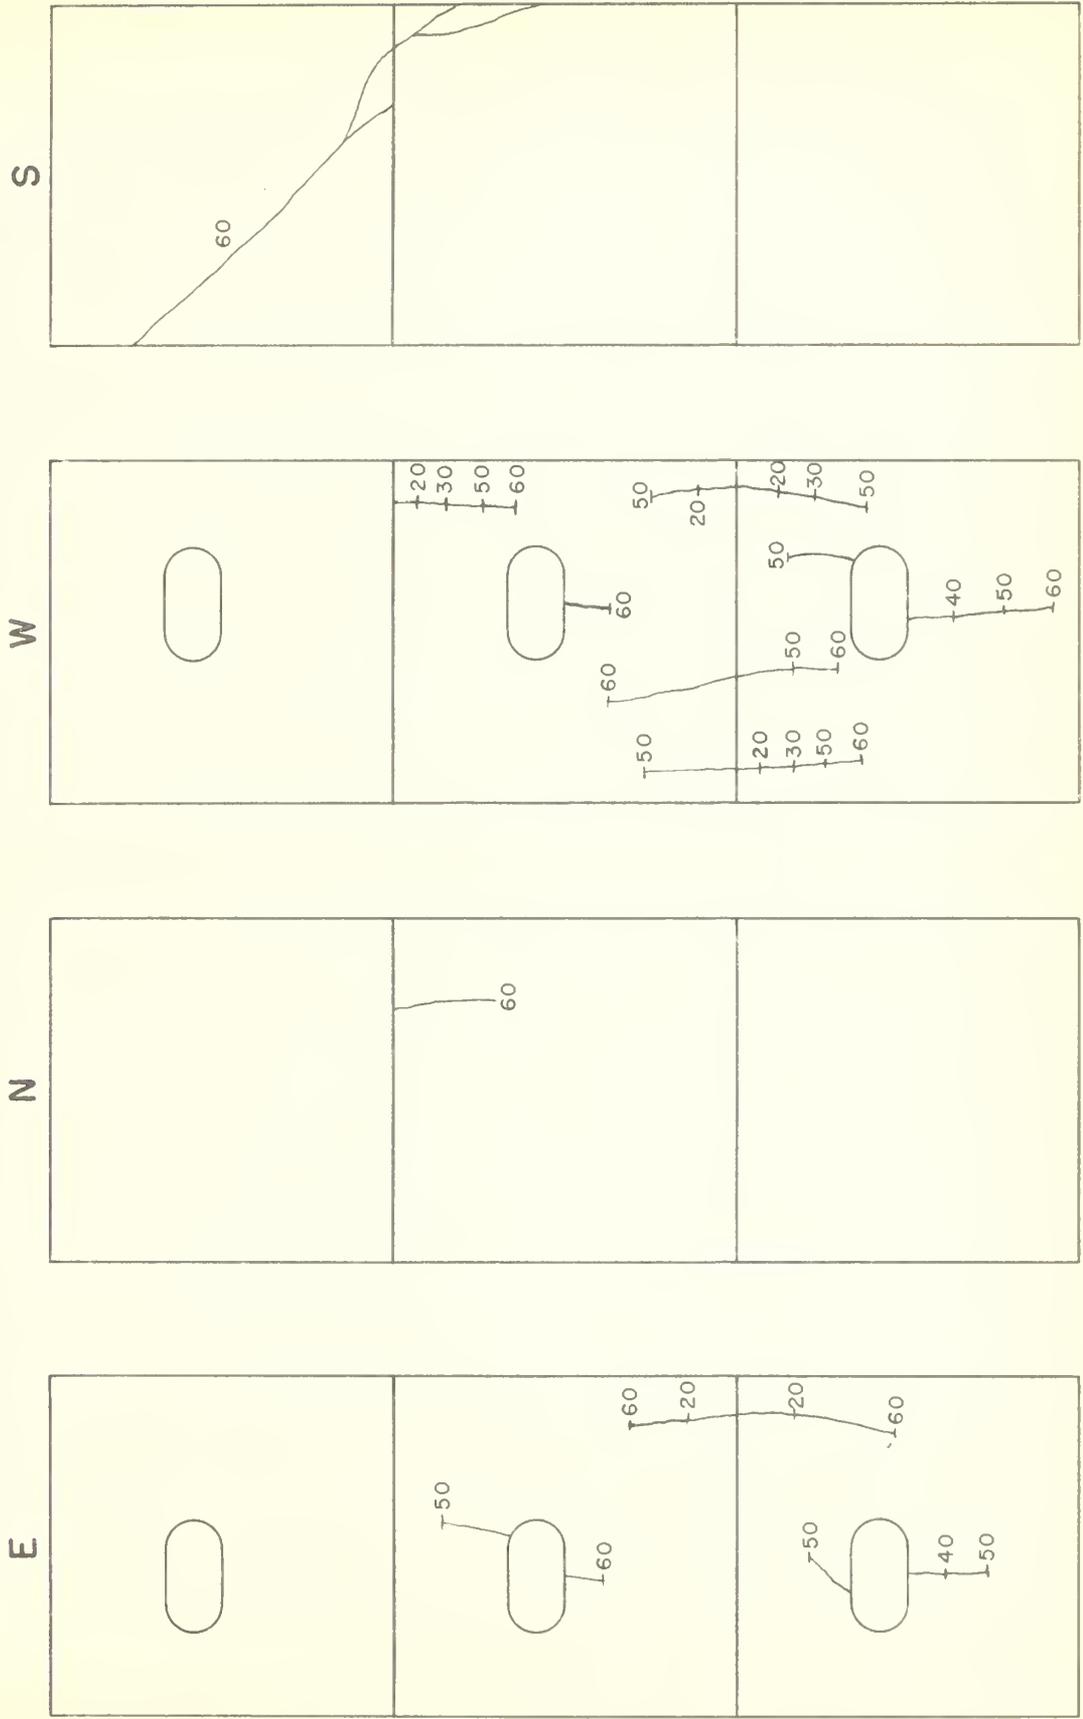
CRACK PATTERN IN COLUMN NO. 10
